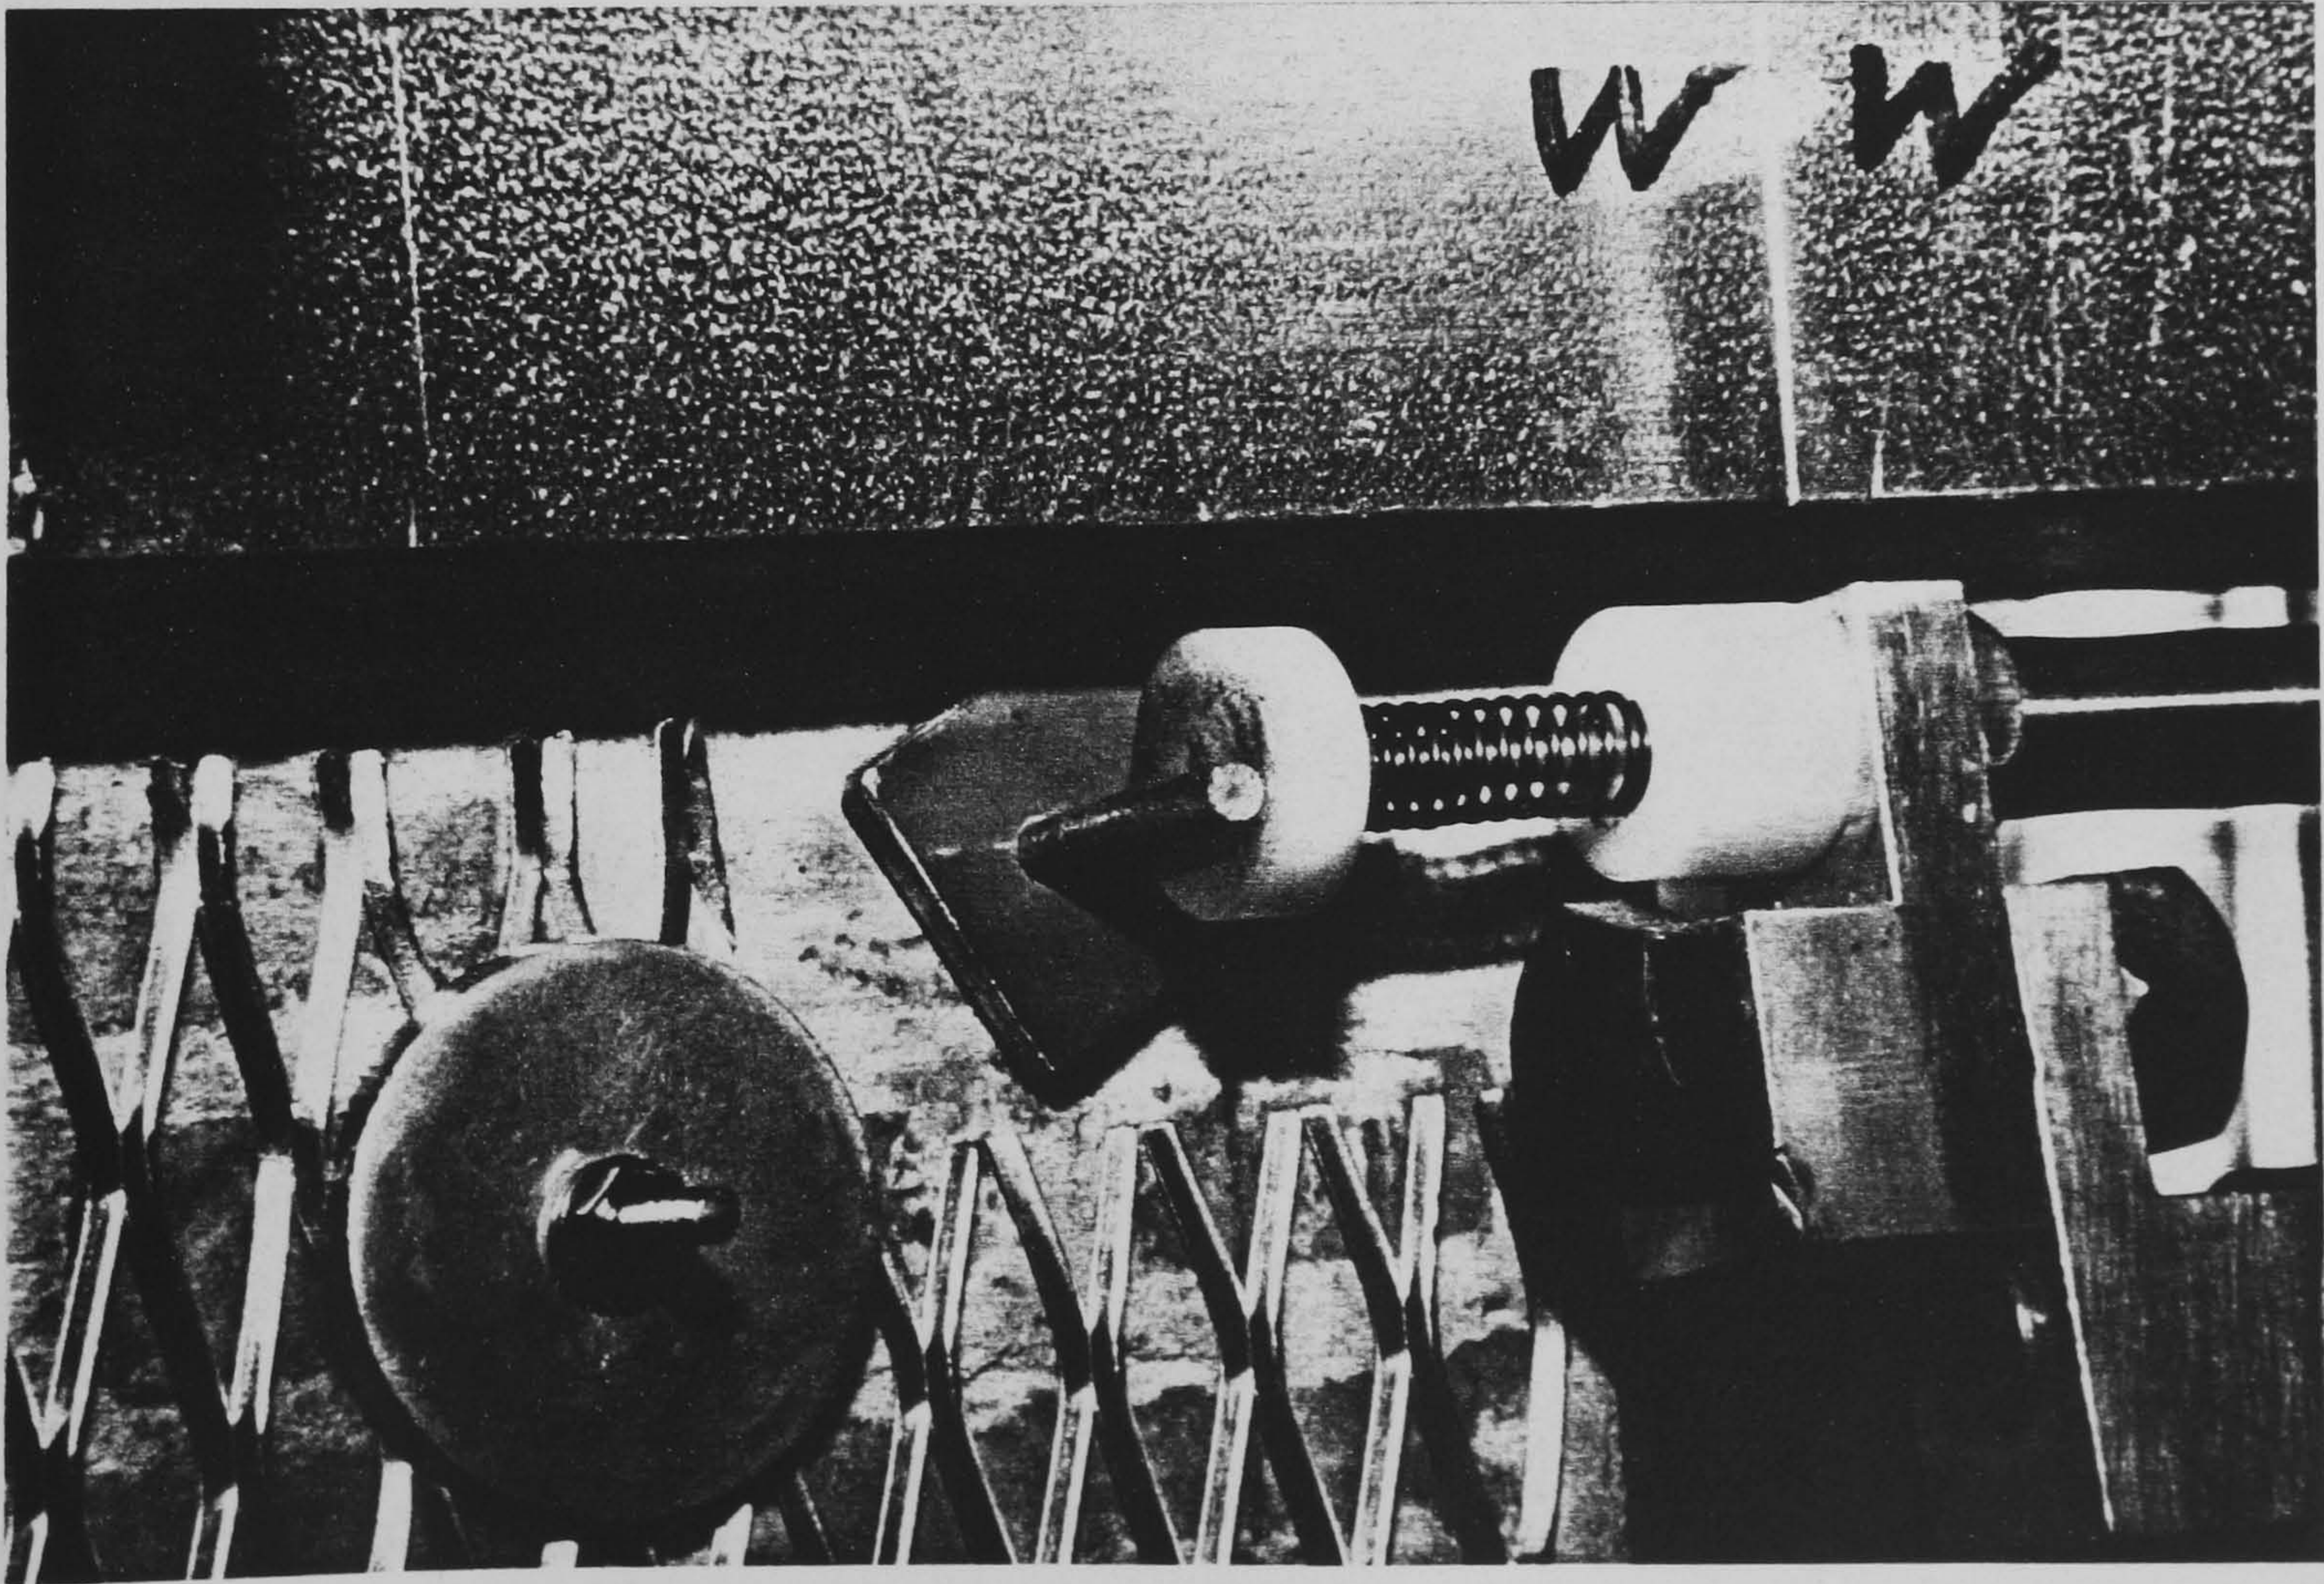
Details of instrumentation and mesh anchoring set-up (wall-M)
